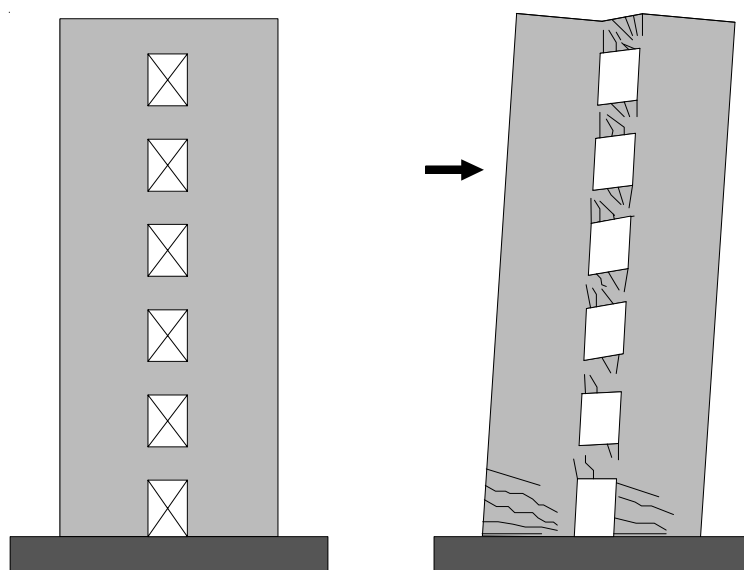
Coupled shear wall and its general failure mechanism
